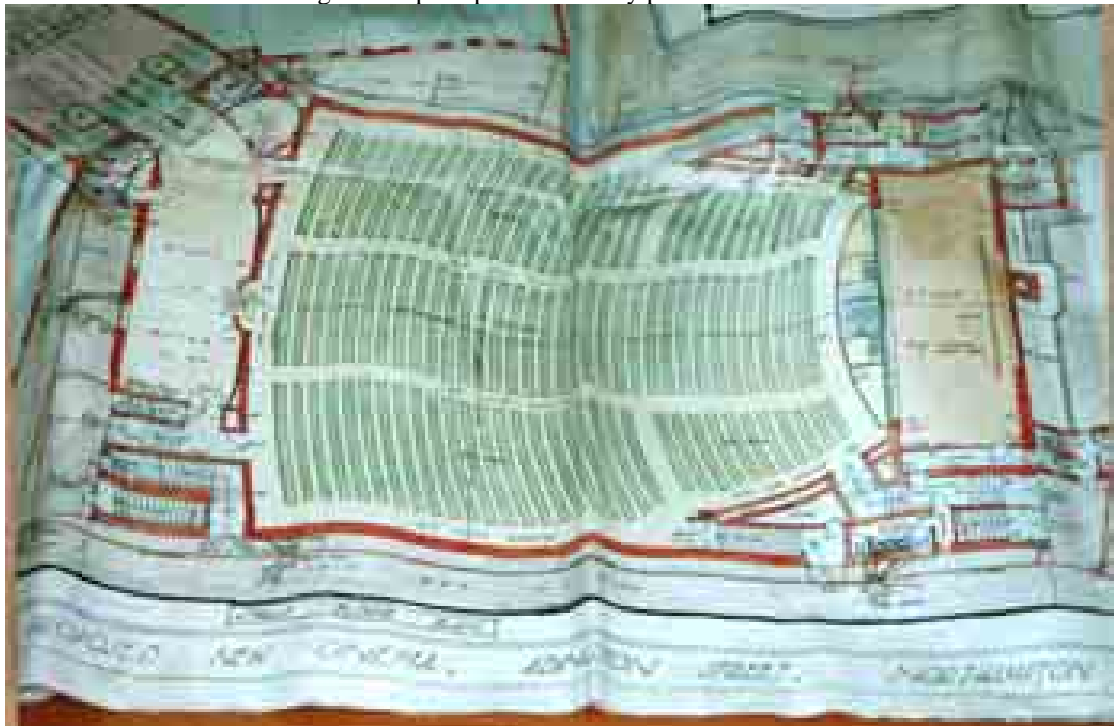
Deposit plans: stalls floor plan NRO Y327
